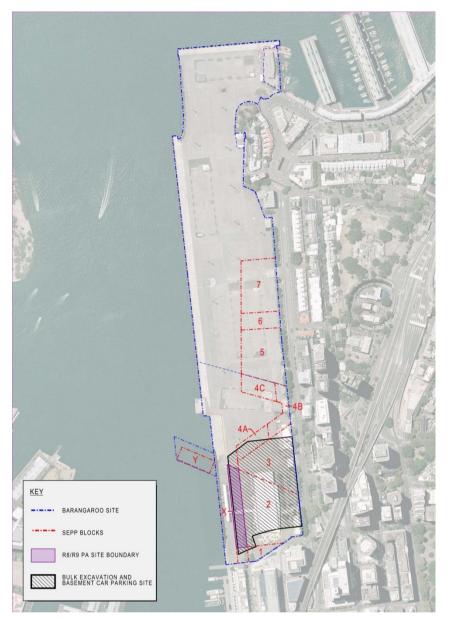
R8 and R9 Residential Building Project Application (MP11\_0002) Aerial Site Location Plan
